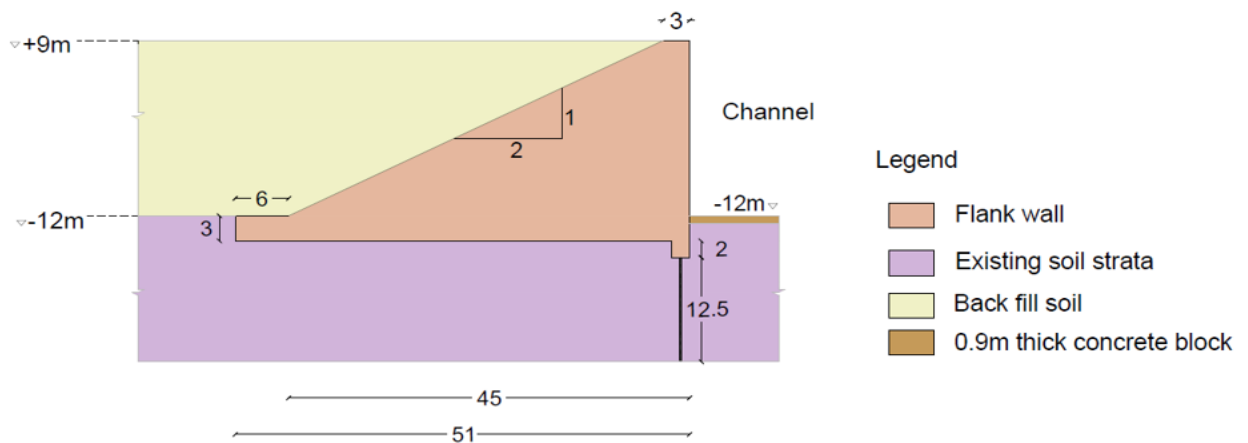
Cross Section of Downstream Vertical Flank Wall
